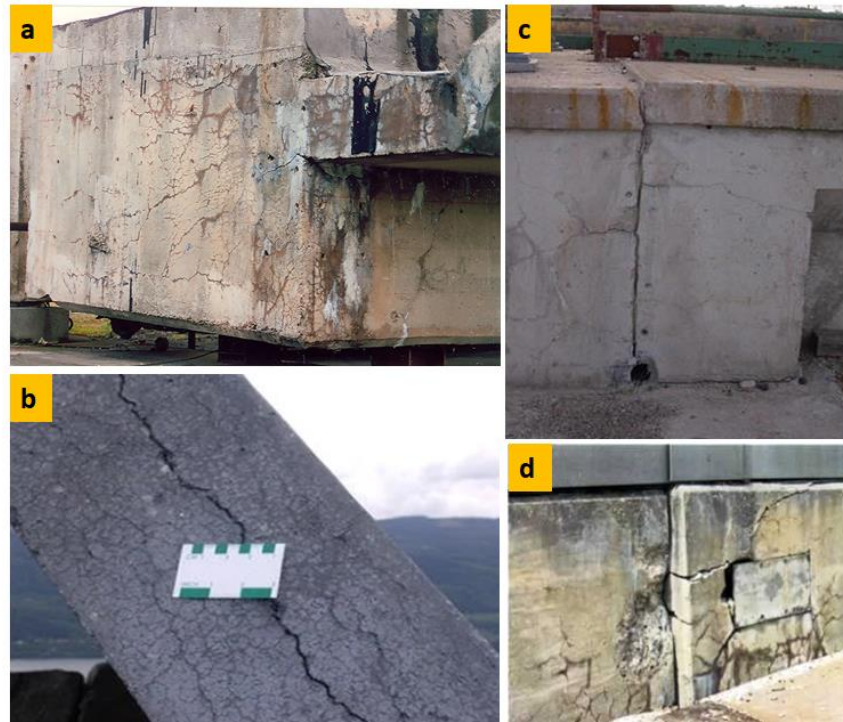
ASR affected concrete showing (a) cracks, exudation, efflorescence, and discoloration on a bridge beam, (b) longitudinal crack on a concrete beam, and (c and d) misalignment of concrete members (Thomas, Fournier & Folliard 2013)
